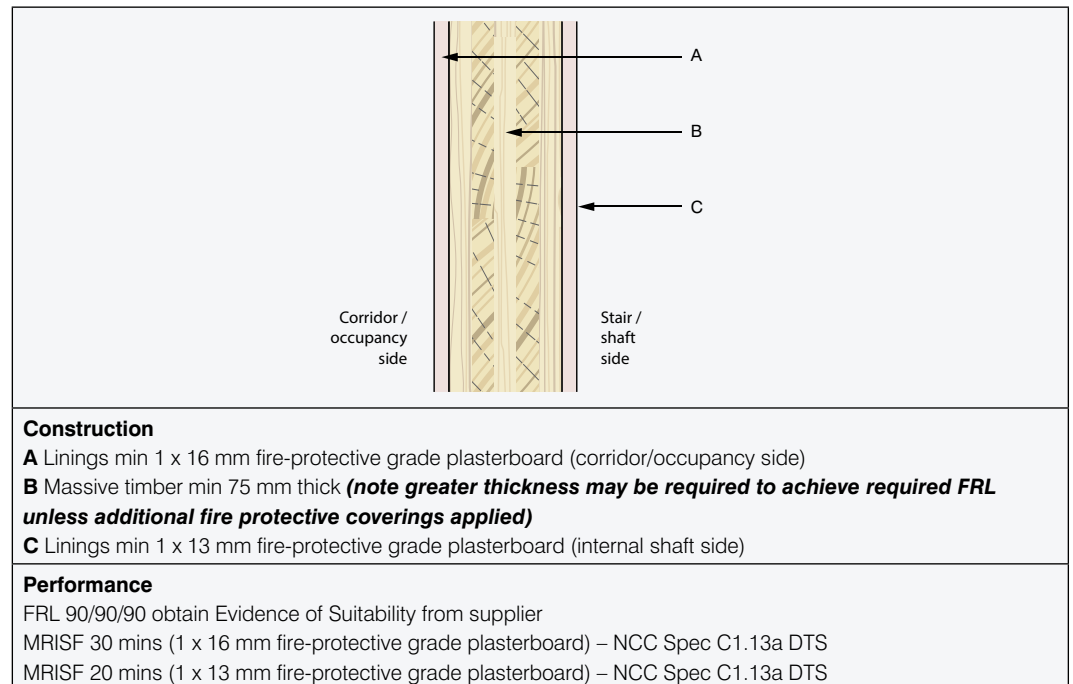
Typical stair and lift shaft construction for single skin massive timber panel construction.
